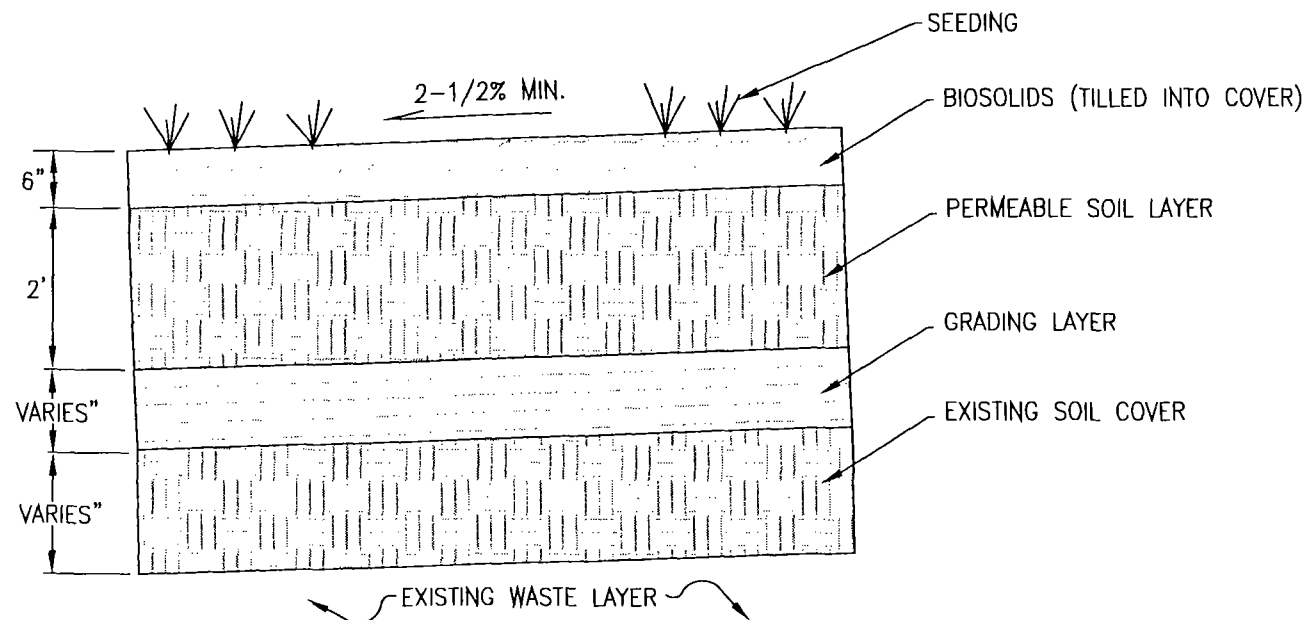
CONCEPTUAL DESIGN PLAN
